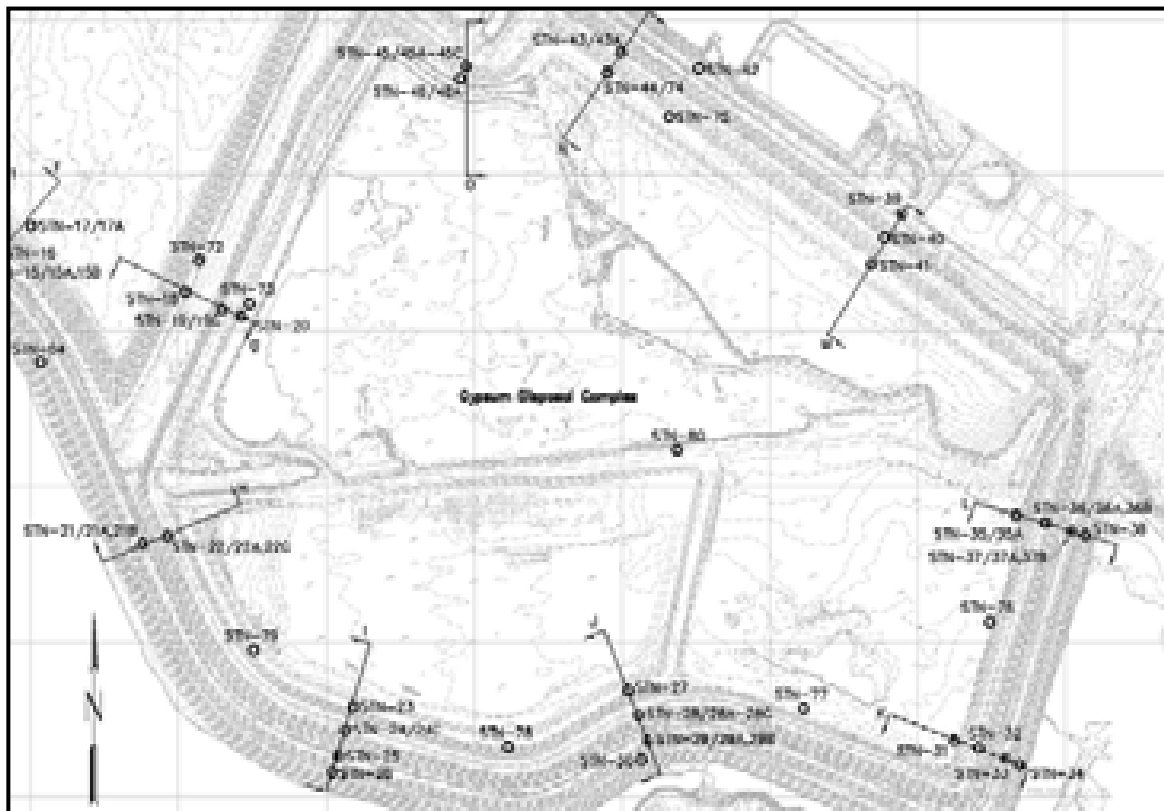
Plan View of the Gypsum Stack Complex and the Stability Cross Sections
